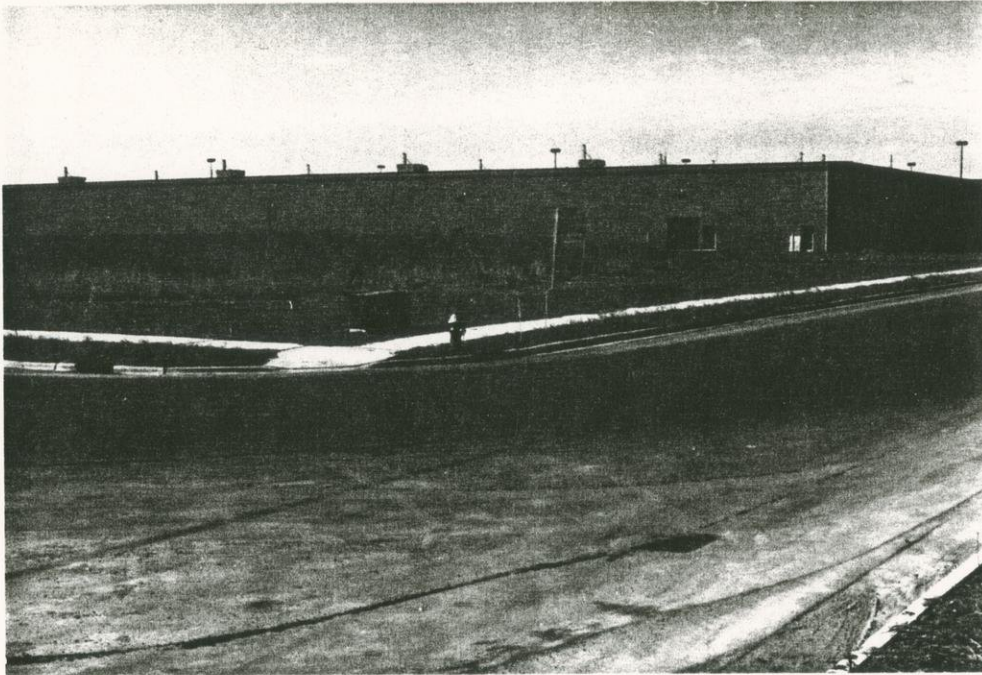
Looking northwest from Royal Avenue/Gisholt Drive intersection at rear of existing South Towne shopping center.
